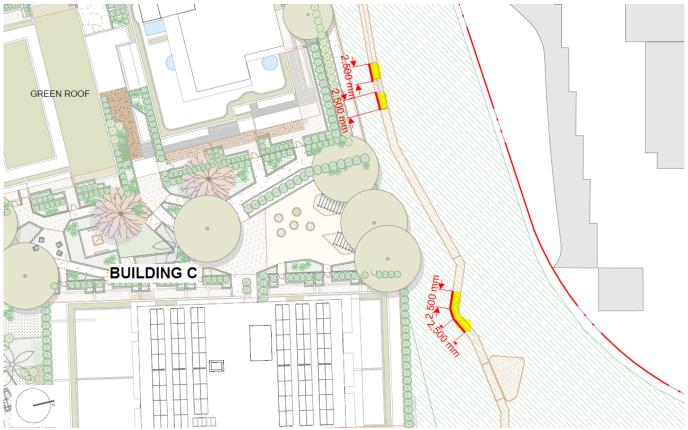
Proposed screening locations (Source: Modified approved plans, Distinctive)
